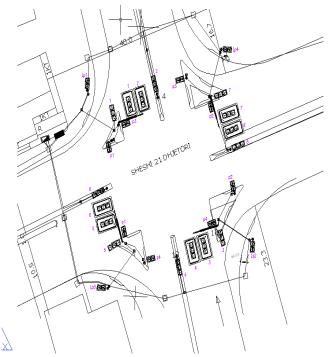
Intersection Road "Muhamet Gjollesha" – Road "Kavajes"
